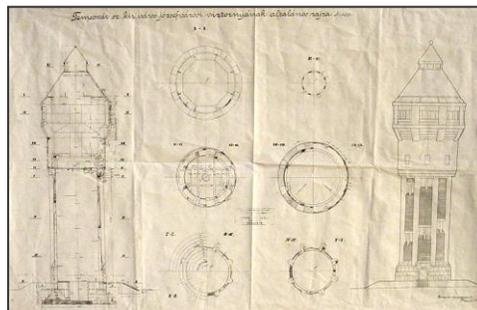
Water tower project in Timisoara made in Budapest in 1913
